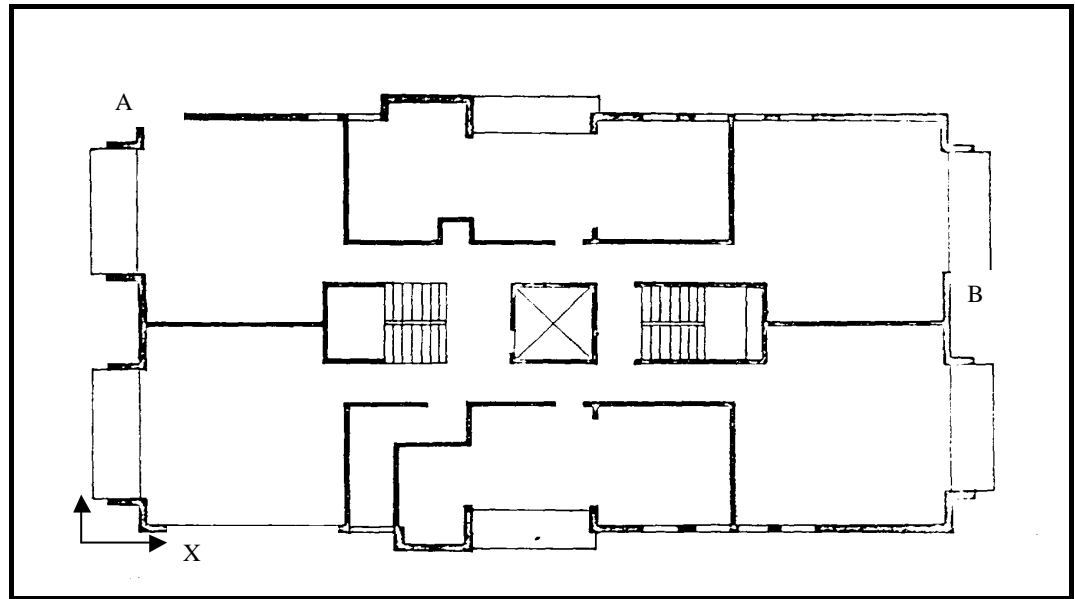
PERTH BUILDING (AFTER PAGE, 1973)
